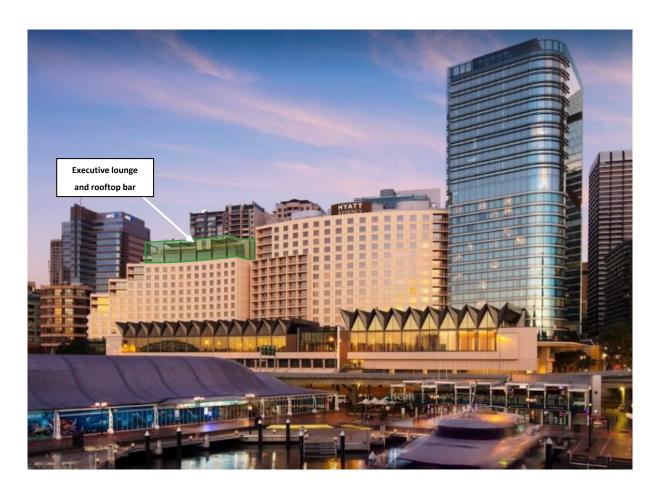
| Subject site as viewed from Pyrmont Bridge, Darling Harbour (Base source: SSD Approval)
